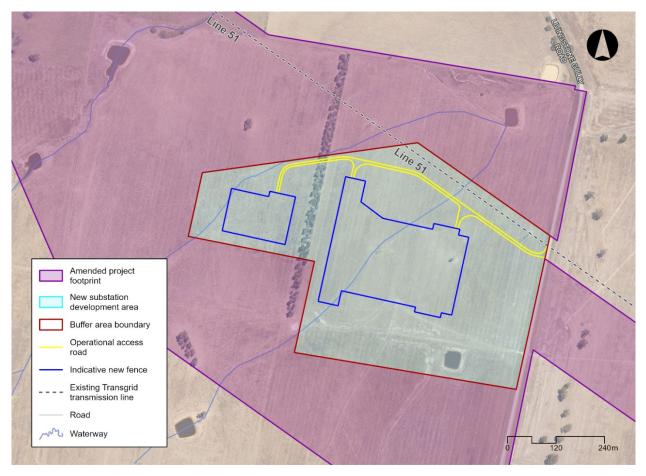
Indicative layout of proposed Gugaa 500 kV substation showing location of operational access road
